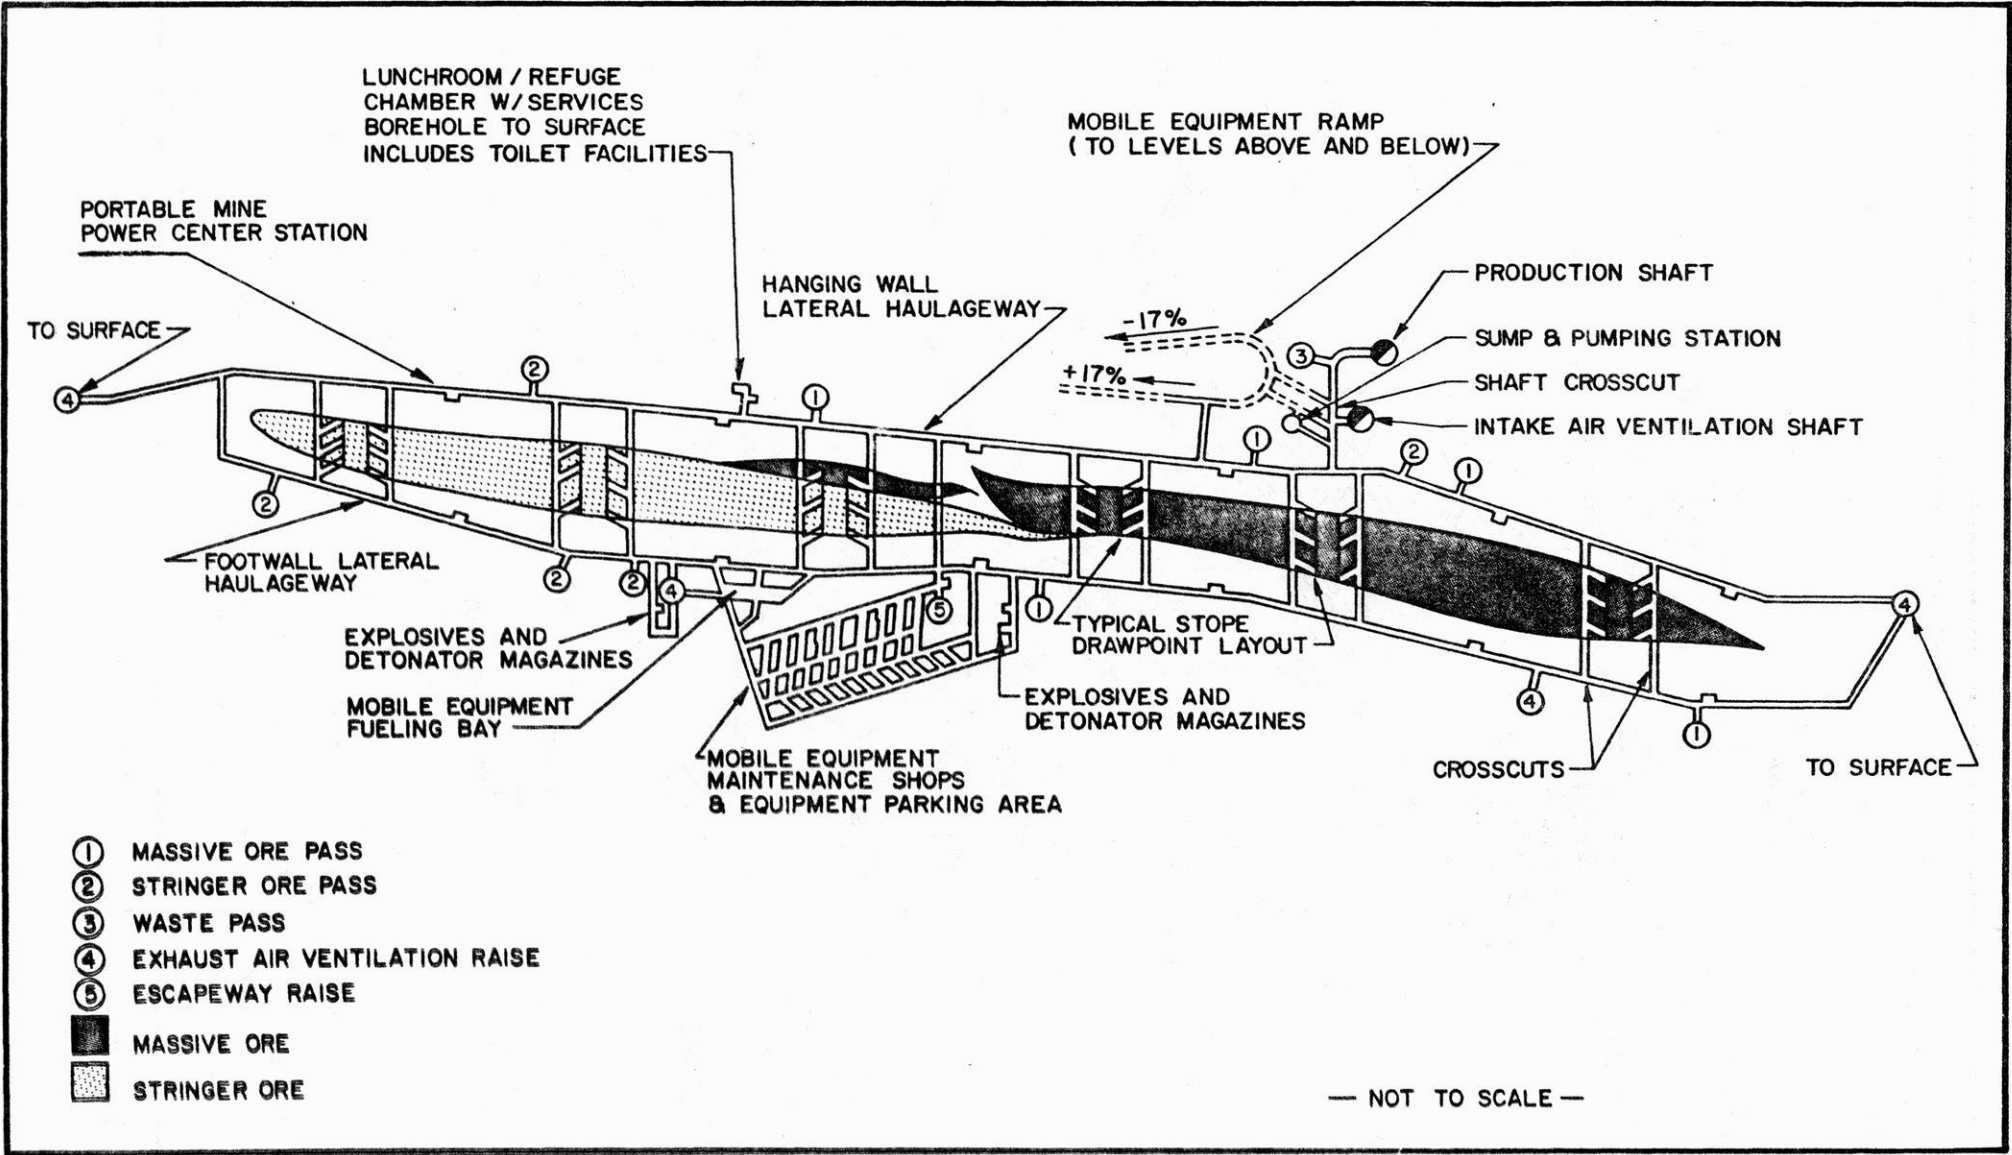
General arrangement of a typical underground main level designed for the proposed Crandon Mine (Plan View).
